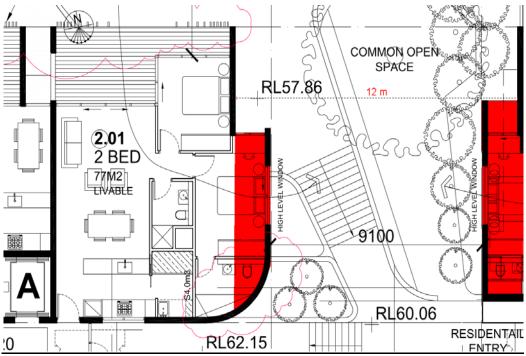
Annotated plan illustrating area of non compliance with 12m setback between building A and Building B (level 1-4) (red shading).
